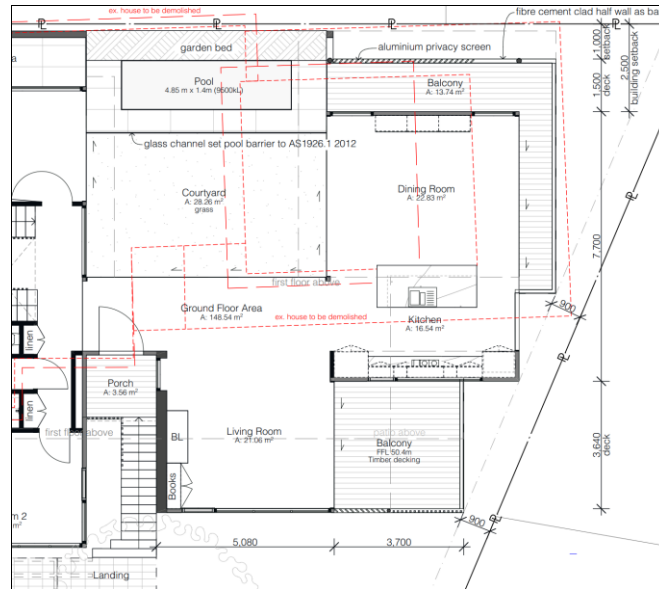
Showing partial footprint details of our clients approved dwelling house at No1 Seddon Hill Road (stamped plans DA2021/0101 - Sheet 104)
